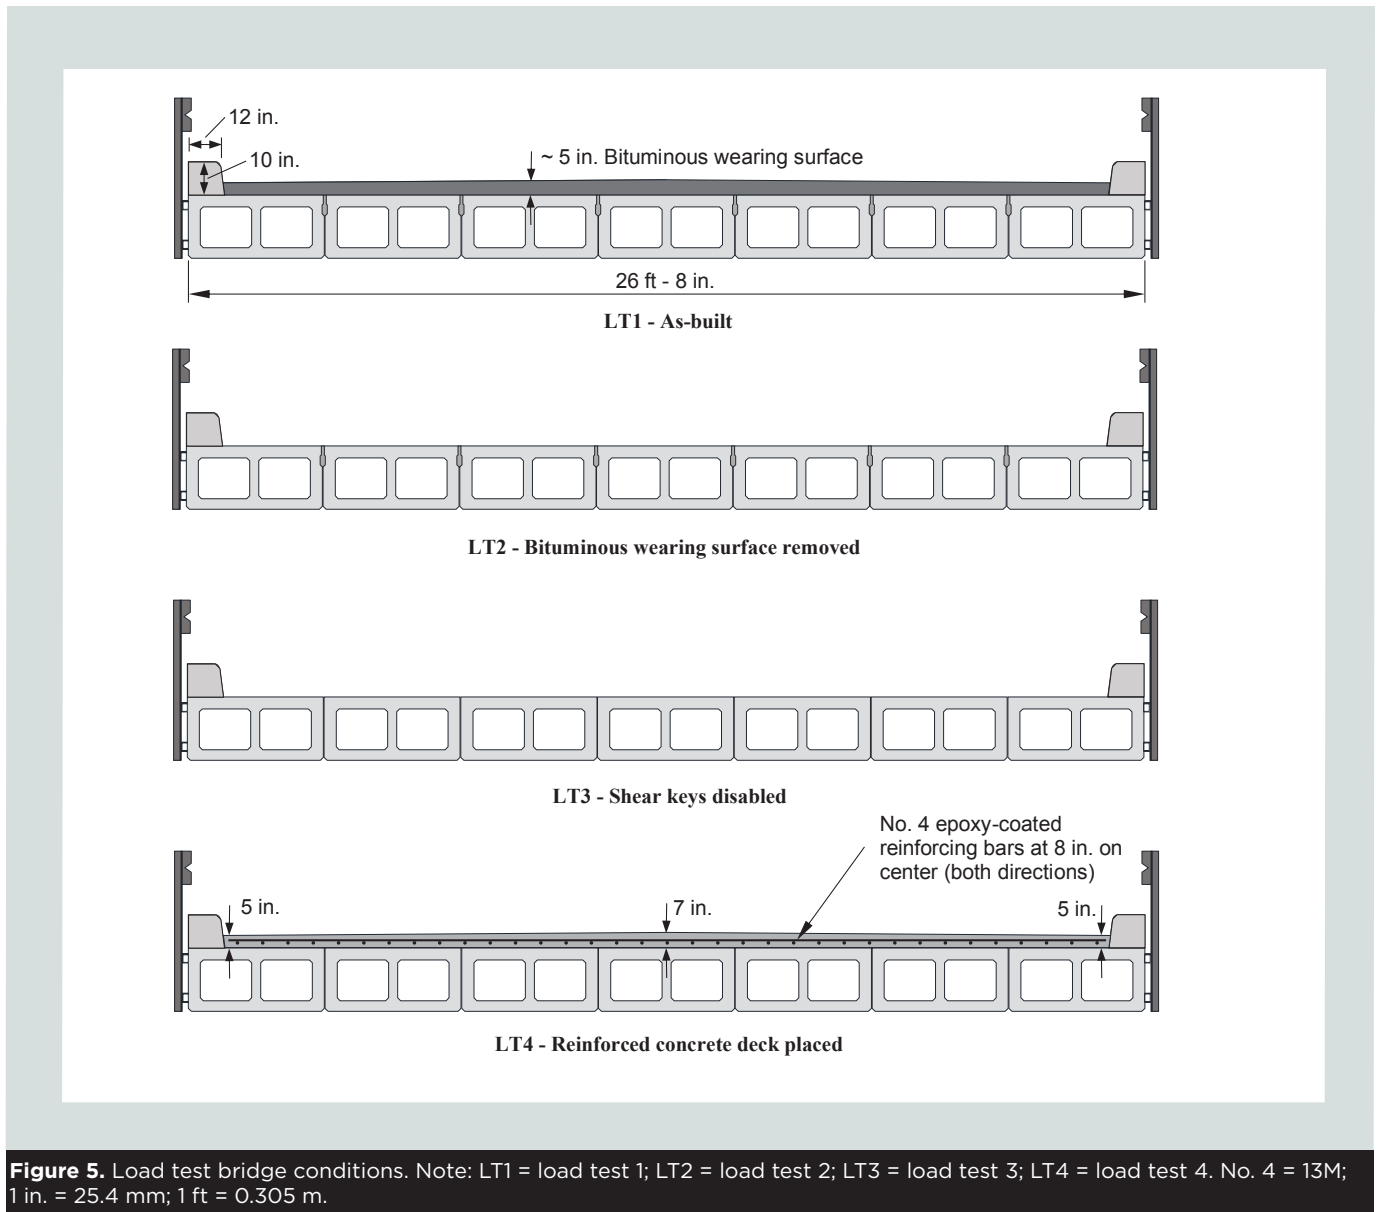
Load test bridge conditions. Note: LT1 = load test 1; LT2 = load test 2; LT3 = load test 3; LT4 = load test 4. No. 4 = 13M; 1 in. = 25.4 mm; 1 ft = 0.305 m.
